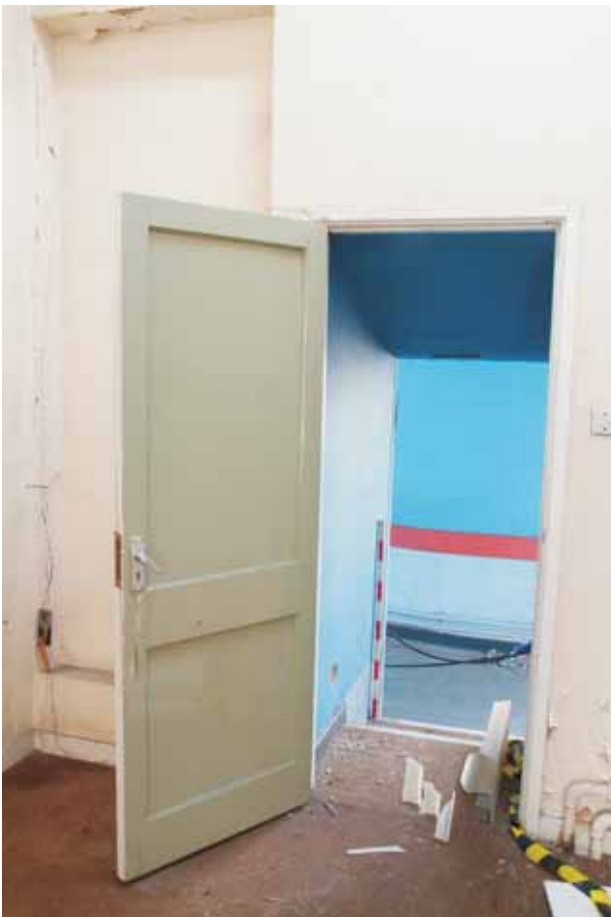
Building 14 – two inserted doorways in south elevation looking through to Building 15, view to the southeast
